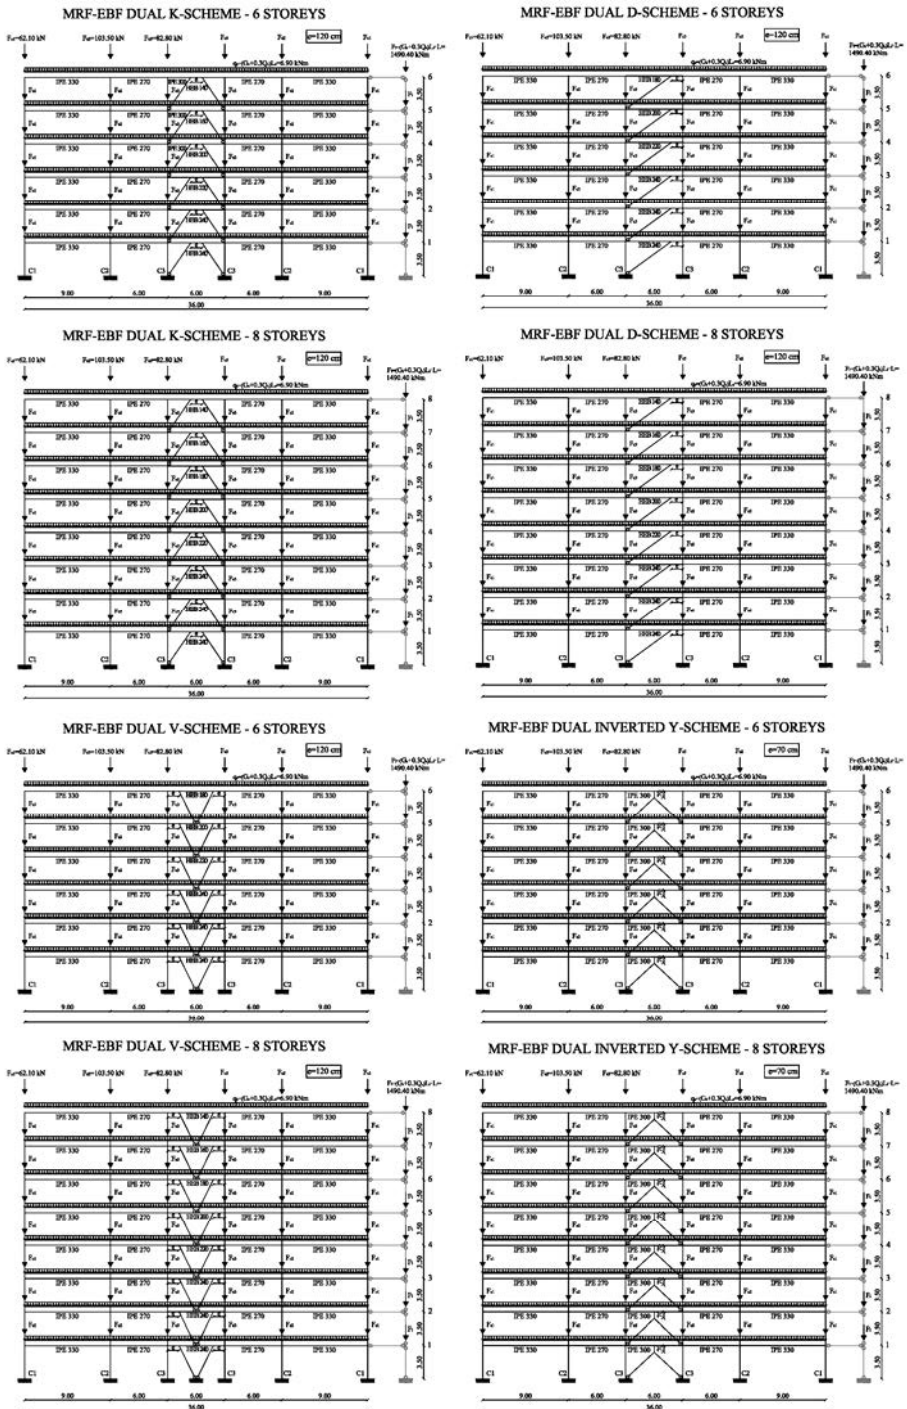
Structural schemes of the longitudinal seismic resistant system for 6-storey buildings.
